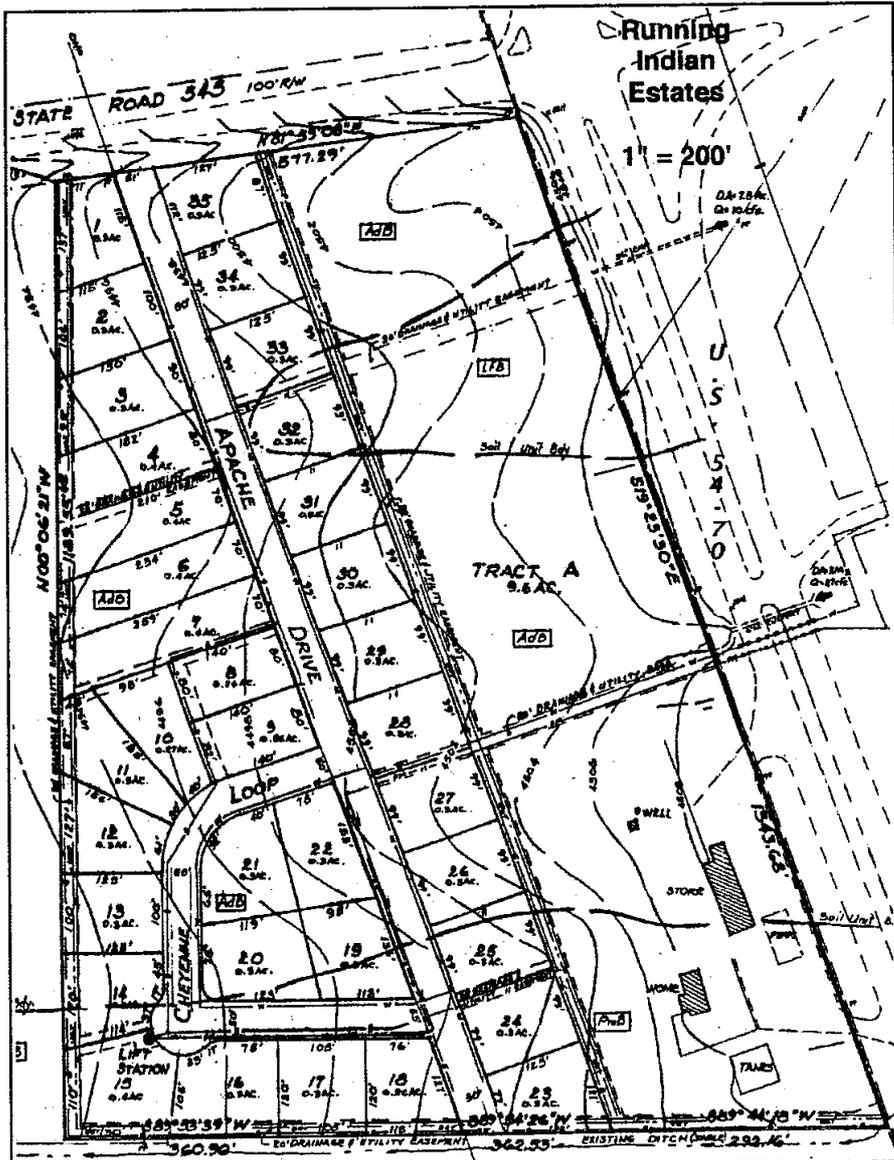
Subdivision Plat Plan for Running Indian Estates.
